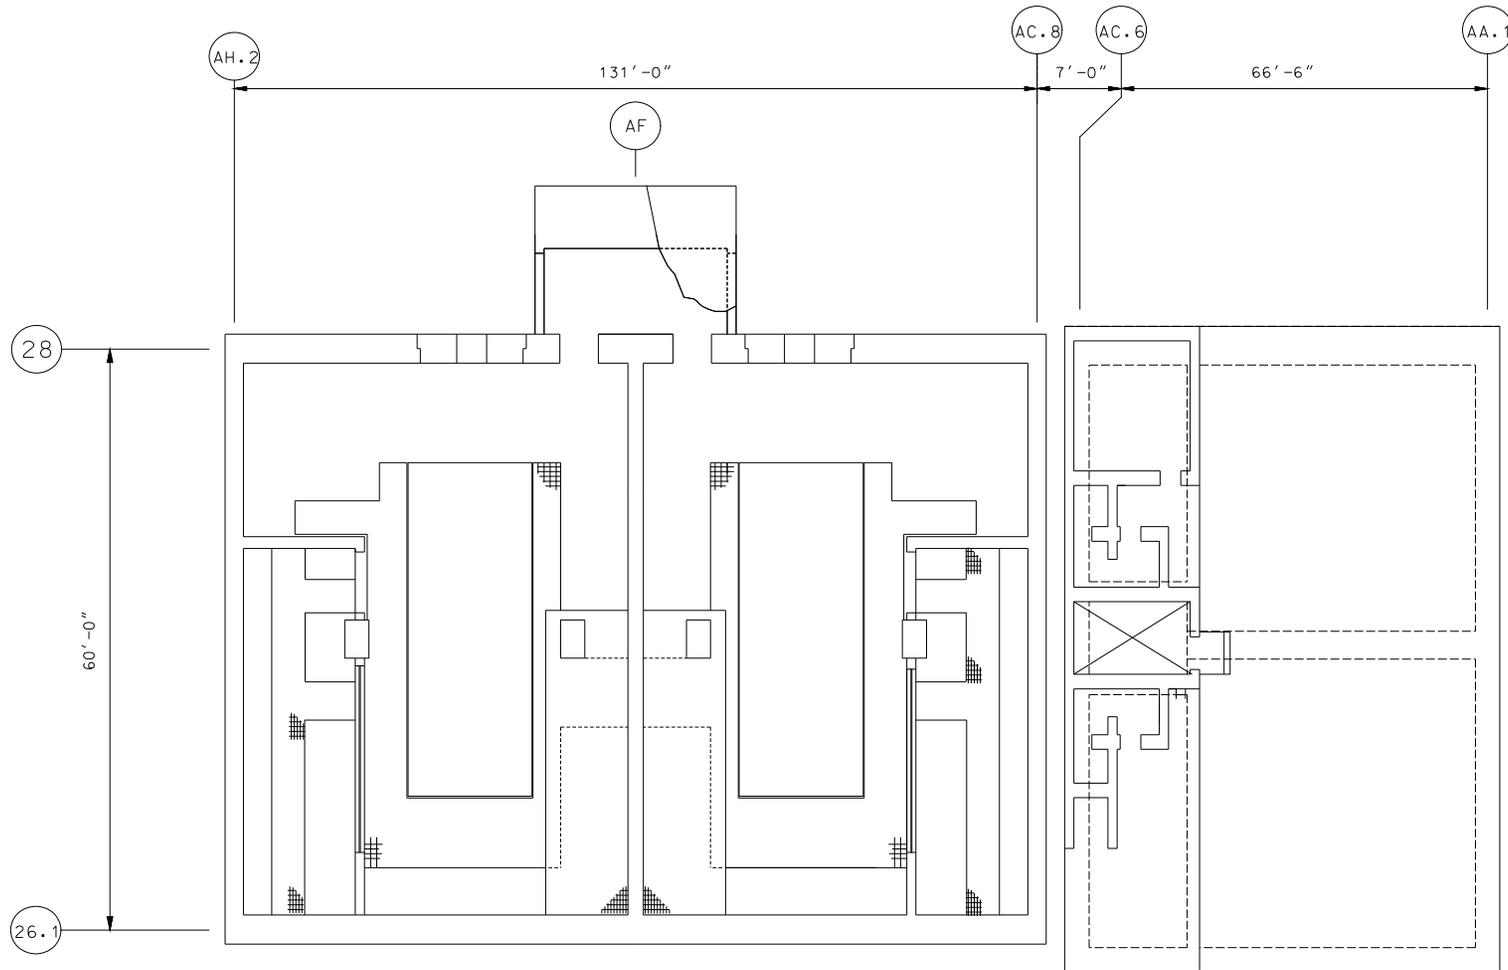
Emergency Diesel Generator Building Block Plan
